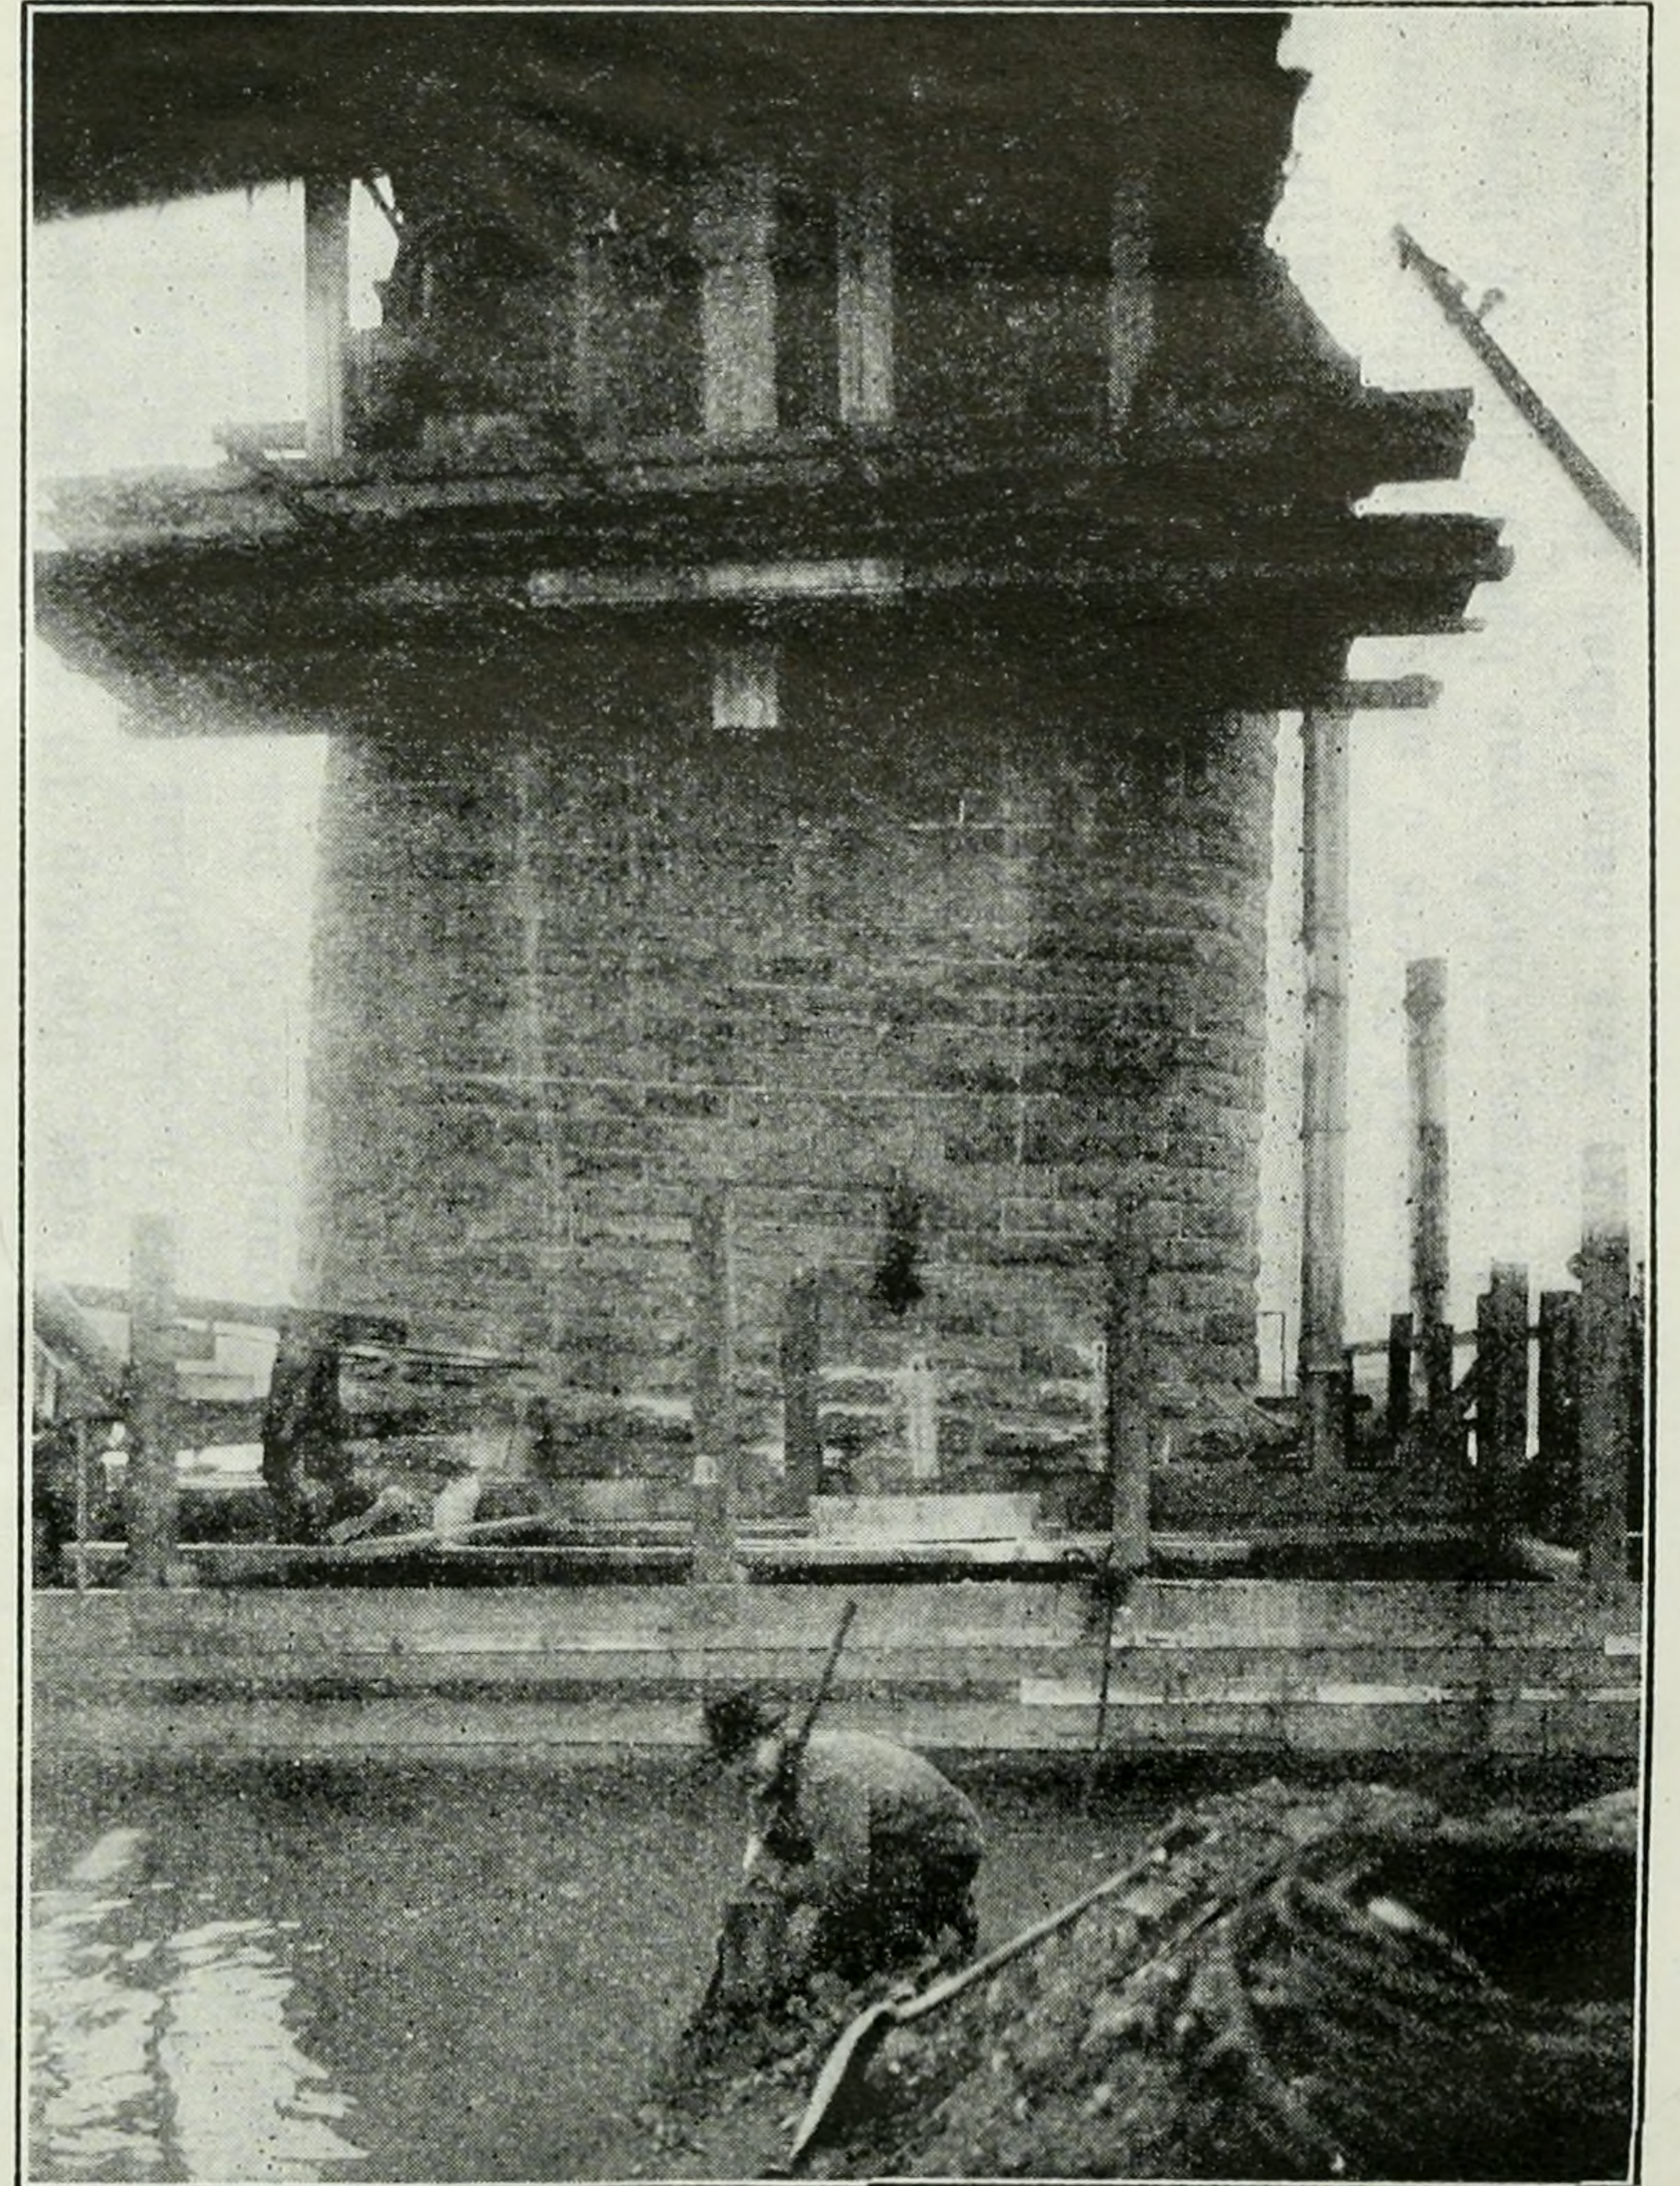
SIDE VIEW OF PIER 4 DURING RECONSTRUCTION.
